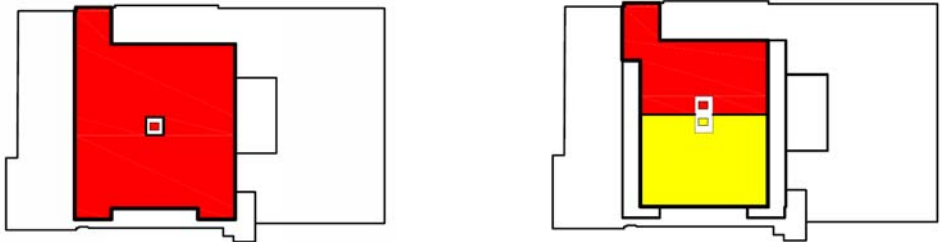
C. Floor 4 and Floor 5 Existing AHU Layout.
